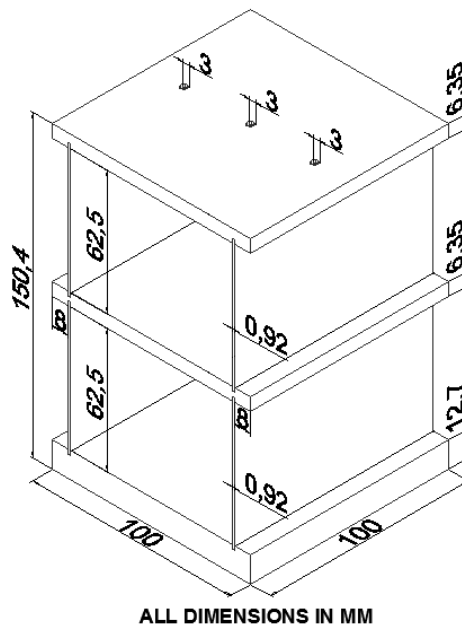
MDOF sway frame (primary structure) centrifuge model dimensions
